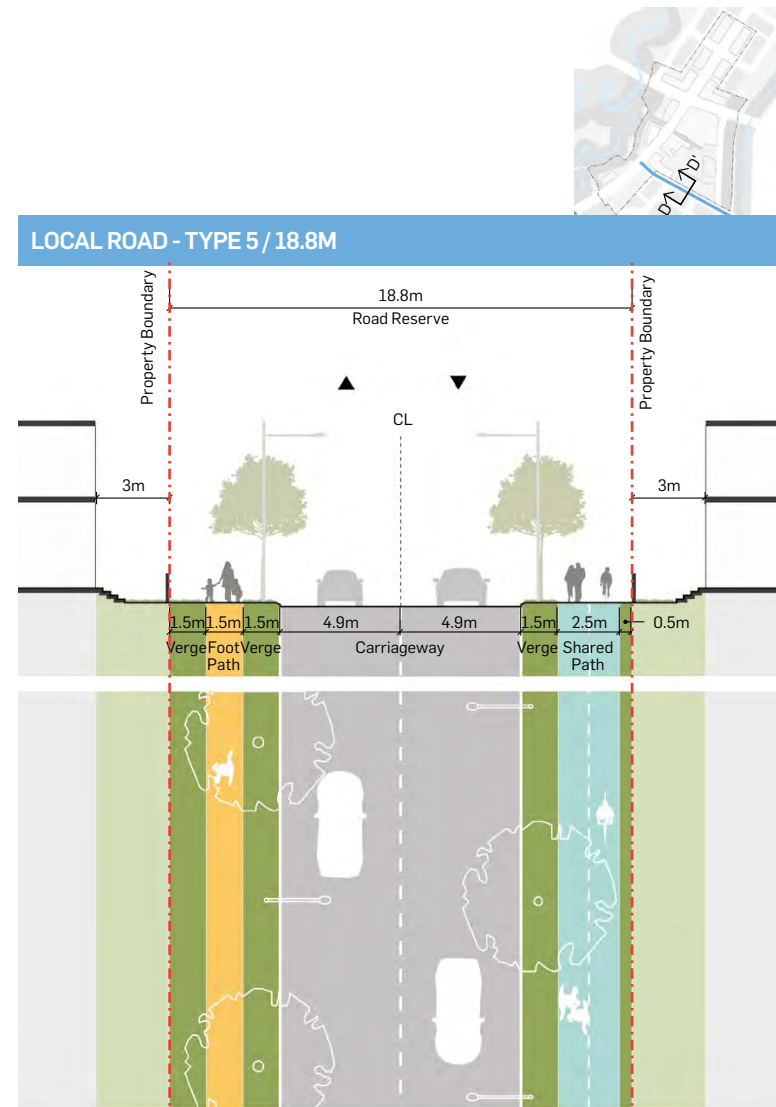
Indicative Street Section D-D' - Local Road - Type 5
